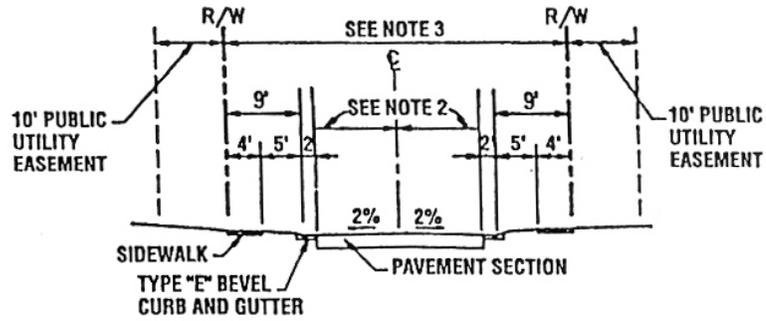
TYPICAL RESIDENTIAL COLLECTOR ROAD LANDSCAPE CROSS SECTION F-F
